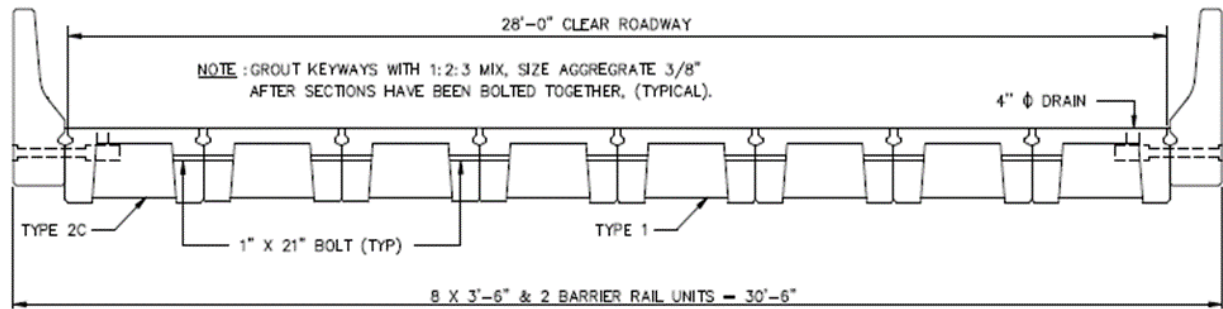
Typical channel beams placed adjacent to one another (Roddenberry, 2012)
